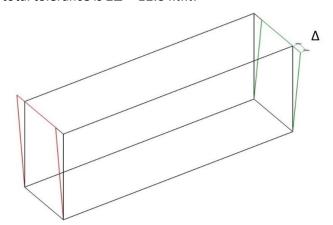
Assembly tolerance, tilt of columns in longitudinal direction
